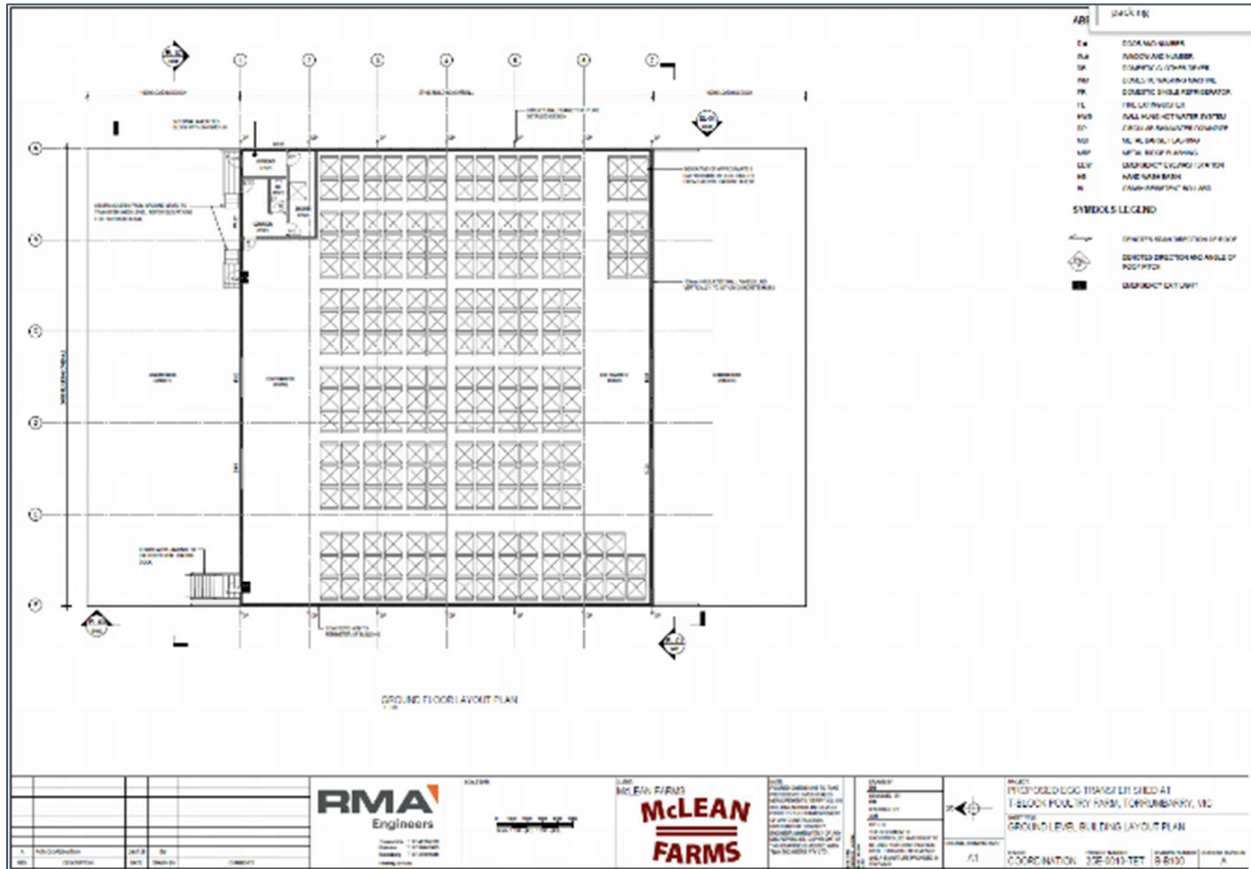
Egg Transfer Building – Floor Plan (RMA Engineers, 2025)
